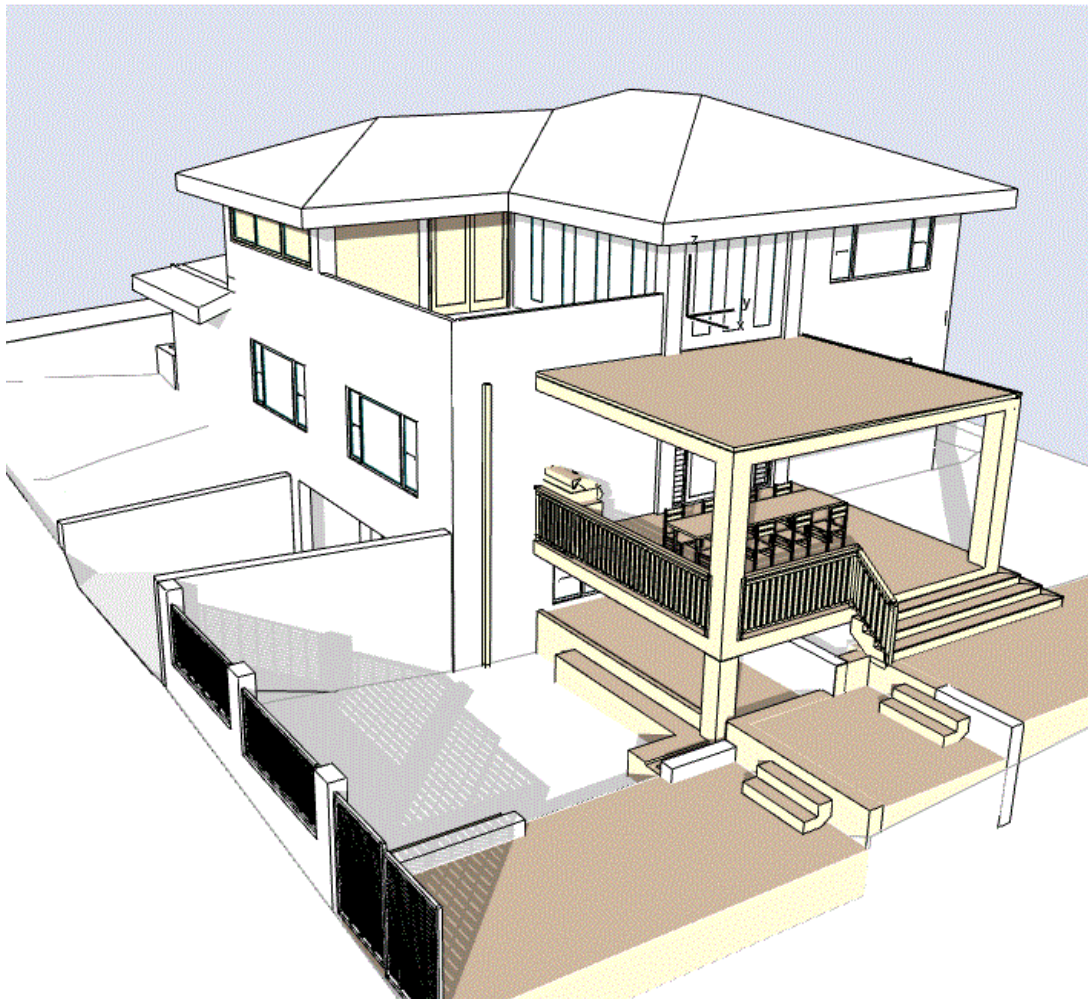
Proposed deck at the off the rear. (*Action Plans 2016.*)
